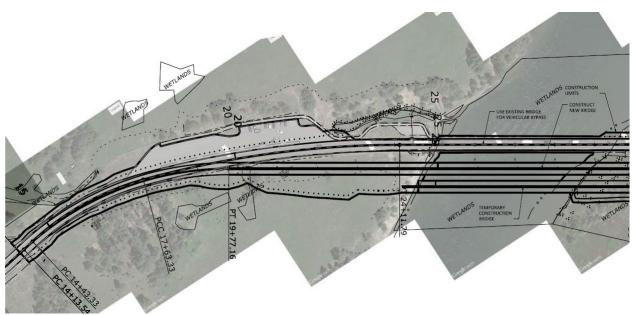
Alternative D (Expanded View, Fishing Bridge, West Side)
